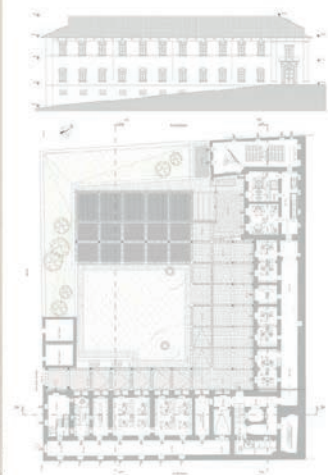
Palazzo Camponeschi in L'Aquila (IT). Historical image of the façade, lower floor and main elevation.
